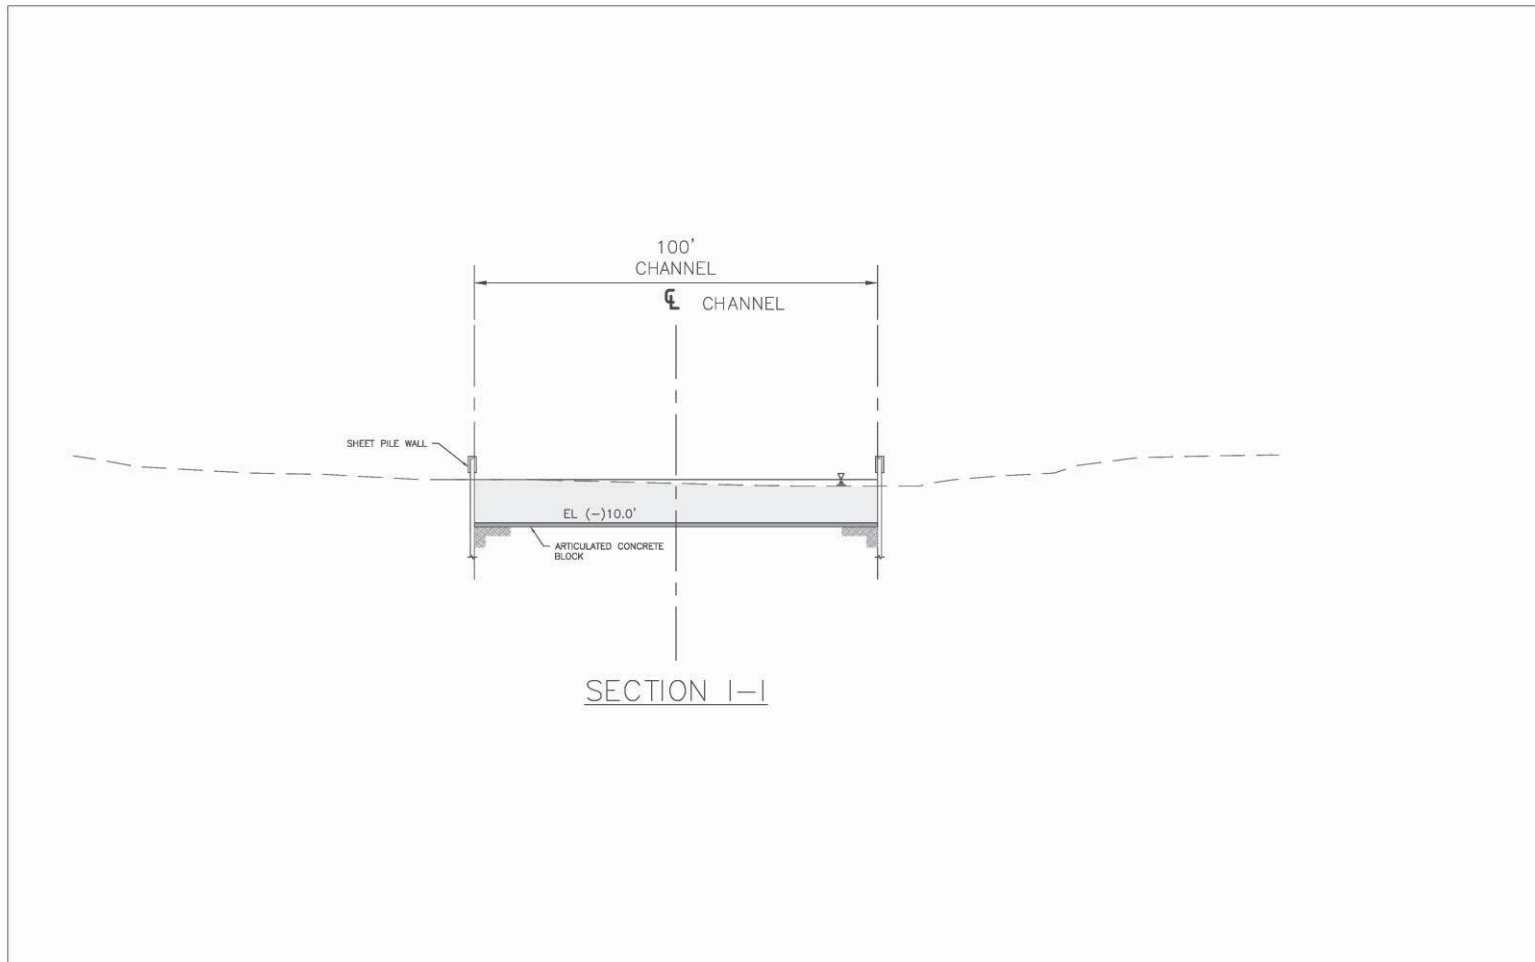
Cross Section I-I, Weir at Ponce de León Avenue Bridge
